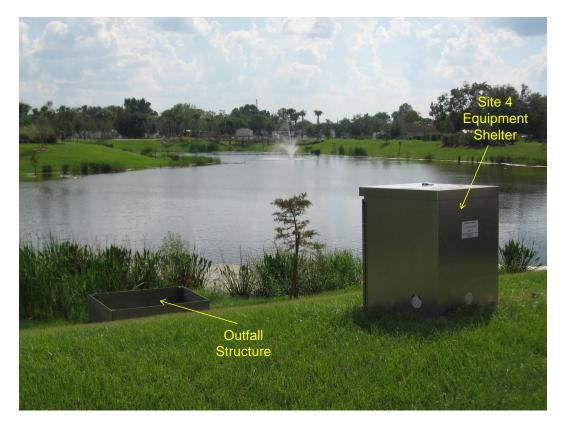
Monitoring Equipment Installed at the Pond Outfall (Site 4).
